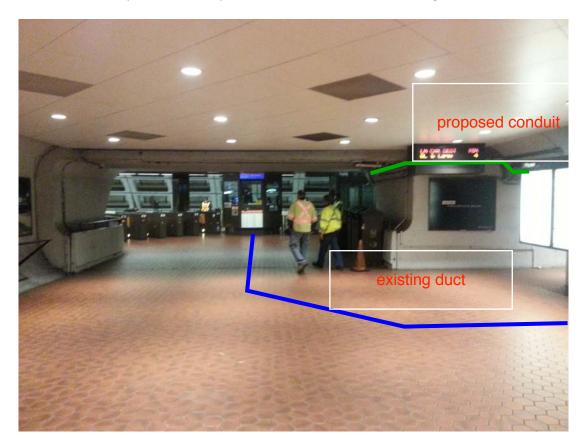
D05 Capitol South: Proposed overhead conduit into backrooms
